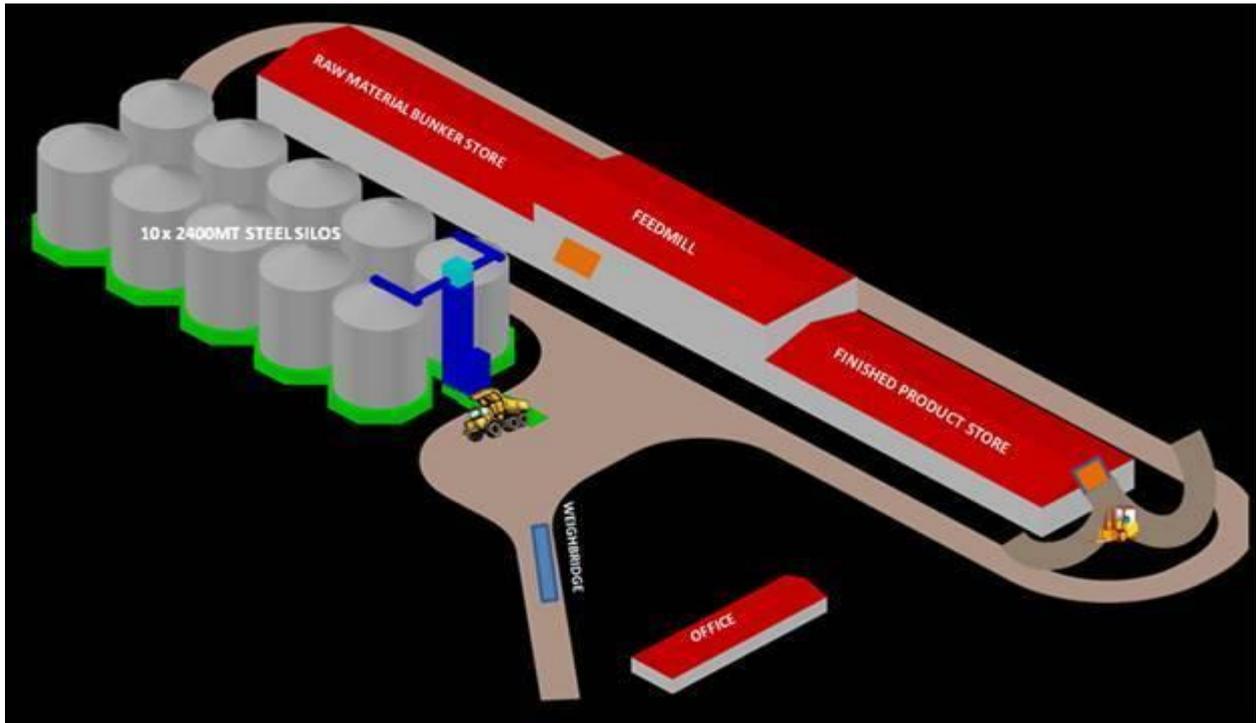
A typical feed mill to be constructed at Makota Farm.
